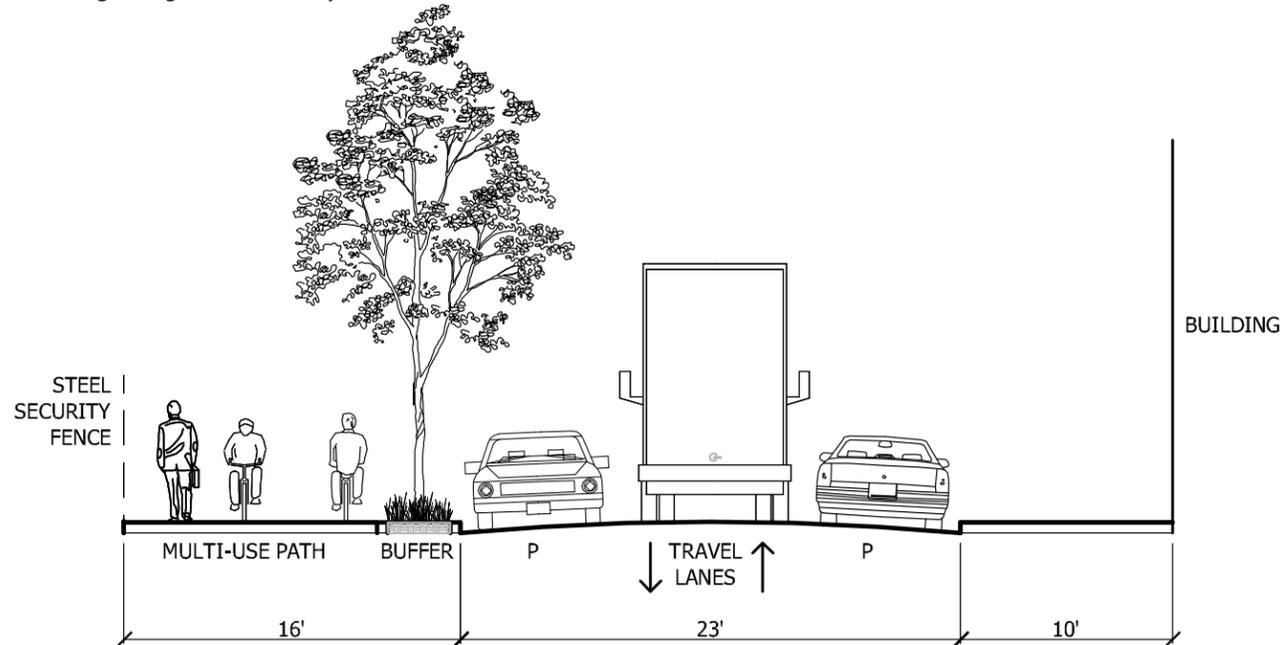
Possible configuration for Imlay Street north of Bowne Street
